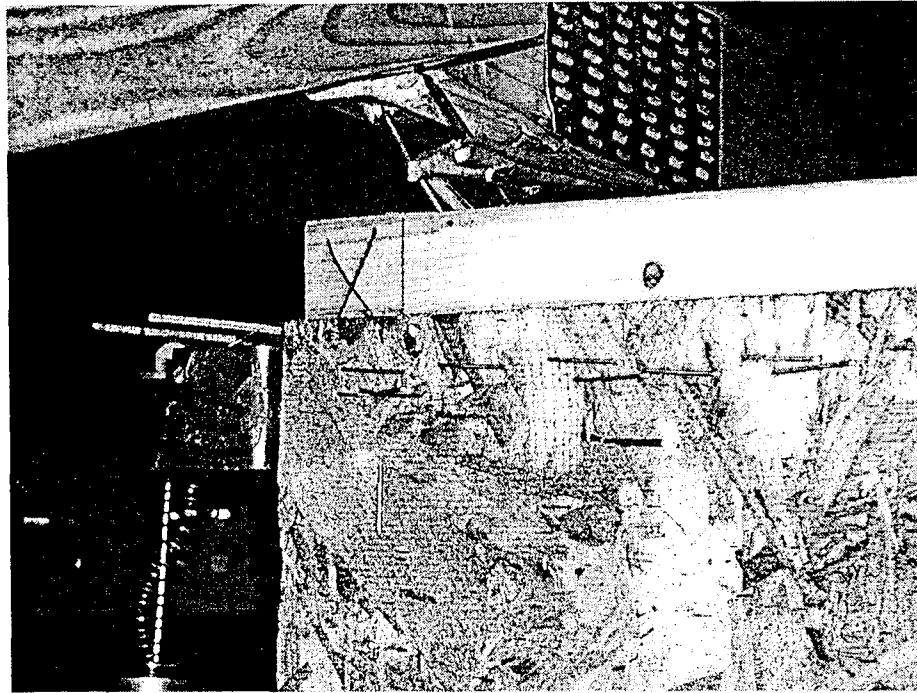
Failure of Toe-nailed Wall-to-Roof Connection
